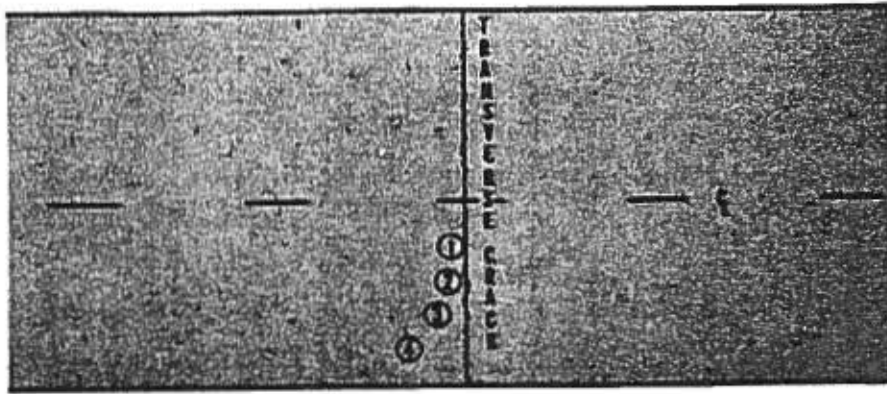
CORE SAMPLE LOCATIONS ADJACENT TO TRANSVERSE CRACK
